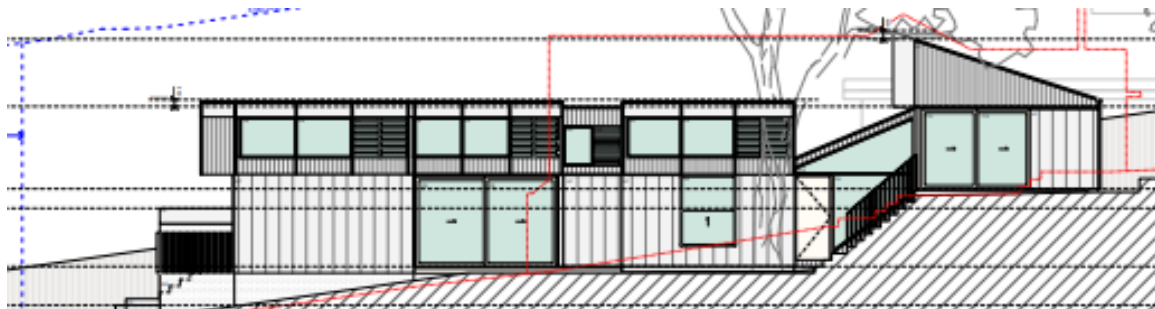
Northern (side) elevation of principal dwelling (source - Adriano Pupilli Architects)
